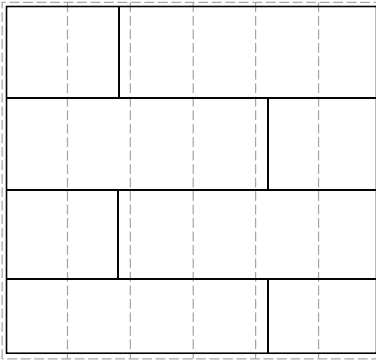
Placement of particleboards on the wood beams in the floor. The dashed lines mark the wood beams.
